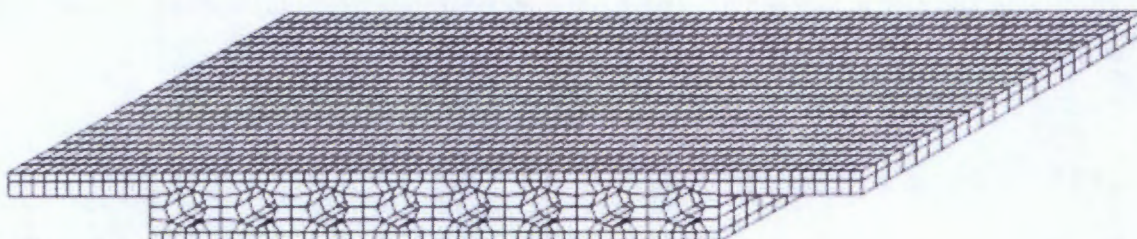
Finite element model of a voided slab bridge deck incorporating wide transverse cantilevers (O'Brien and Keogh, 1998).
